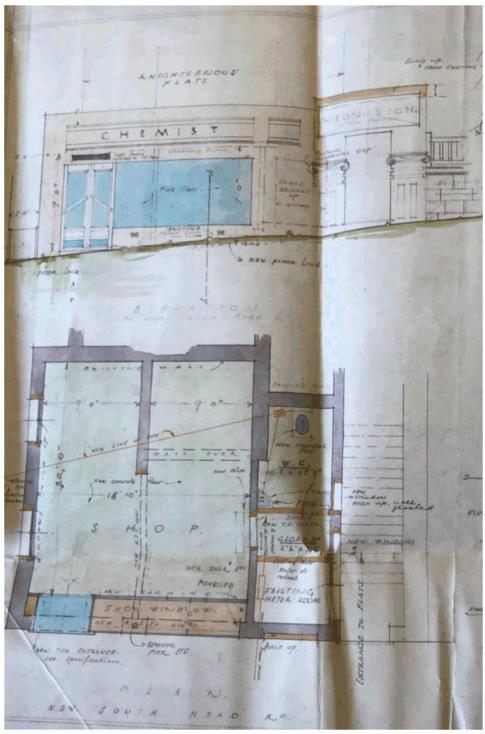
Plan of new shop premises along New South Head Road, 1934.
